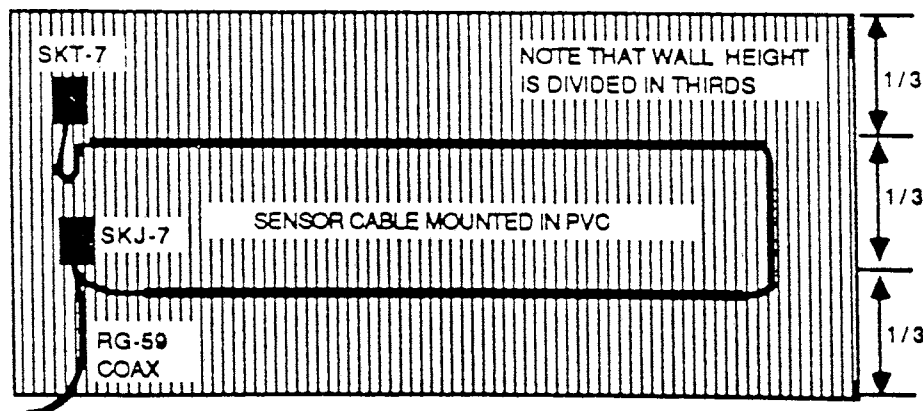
Cable Spacing for 10 Foot (3 m) High Wall
